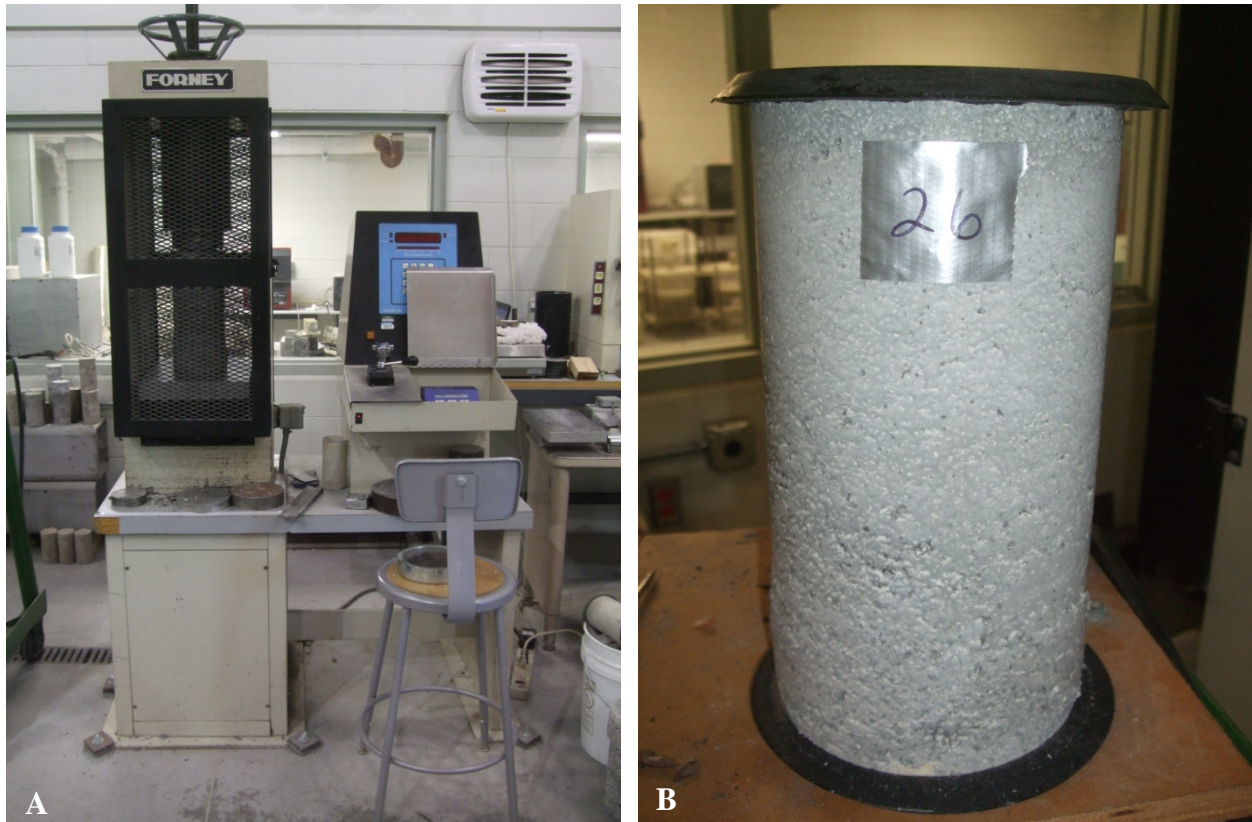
Testing of cylindrical concrete samples. (a) hydraulic testing equipment loaded with sample; (b) sample after testing.
